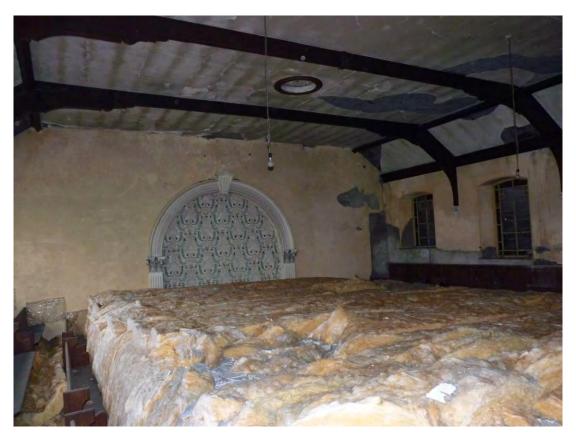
View from the top of the  $\mathbf{1}^{\text{st}}$  floor access stairs, showing the insulation-covered inserted ceiling. View east.
